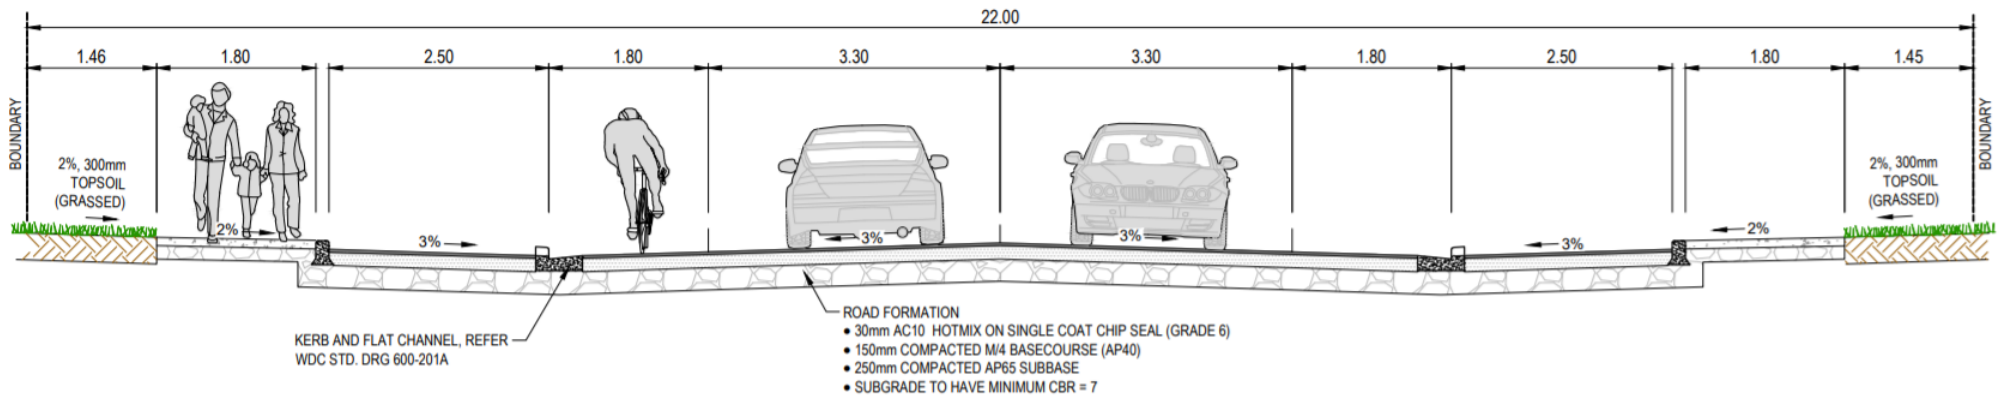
Typical Cross Section for Road 1 South of Cam River
